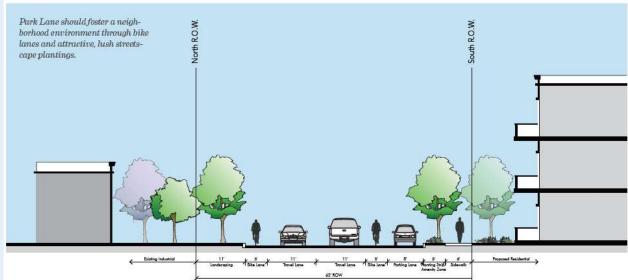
PROPOSED PARK LANE STREET SECTION
